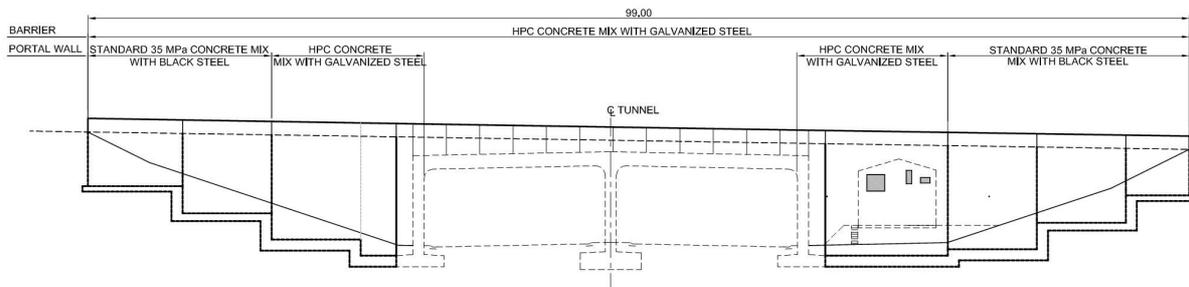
ELEVATION OF TUNNEL PORTAL, SHOWING STEPPED FOOTINGS AND CONTROL BUILDING
